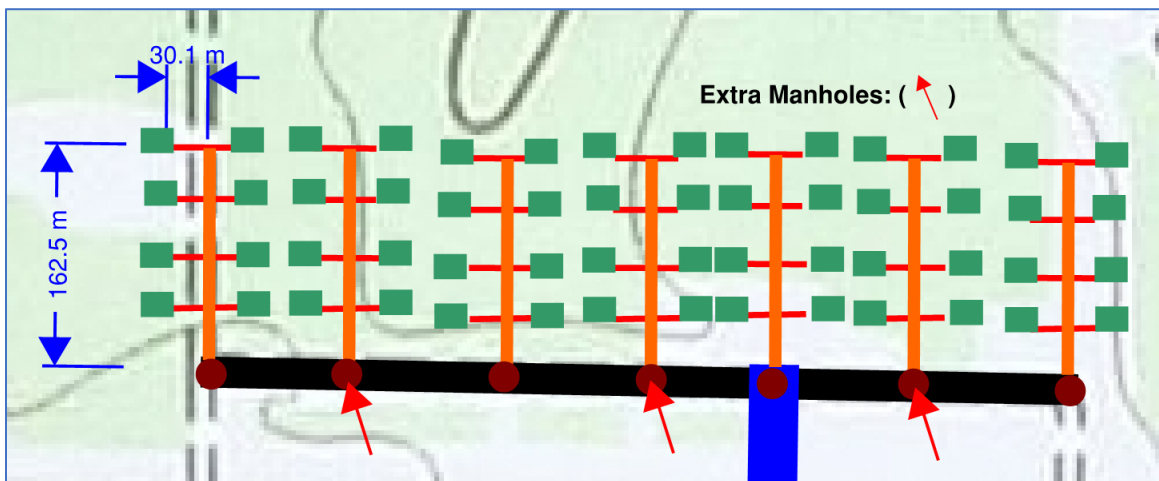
Conventional sewer connections between houses and streets and additional manholes required.
